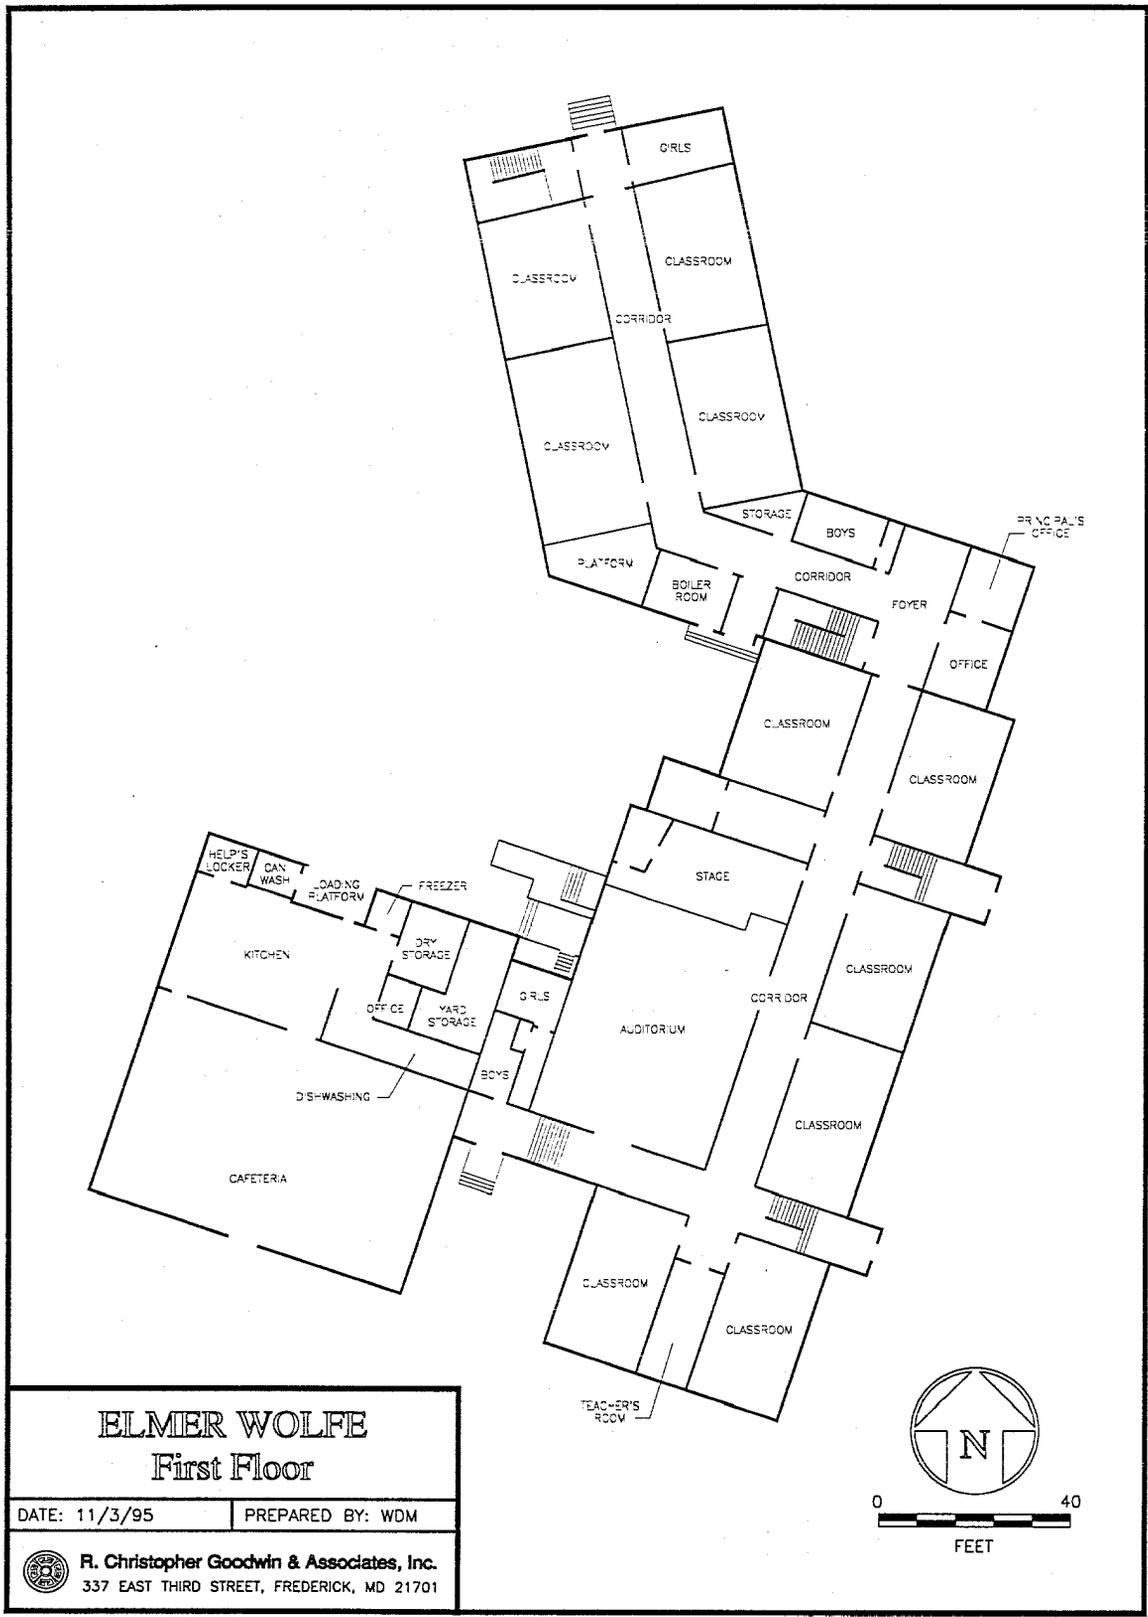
First floor plan, Elmer Wolfe School, with current room designations
